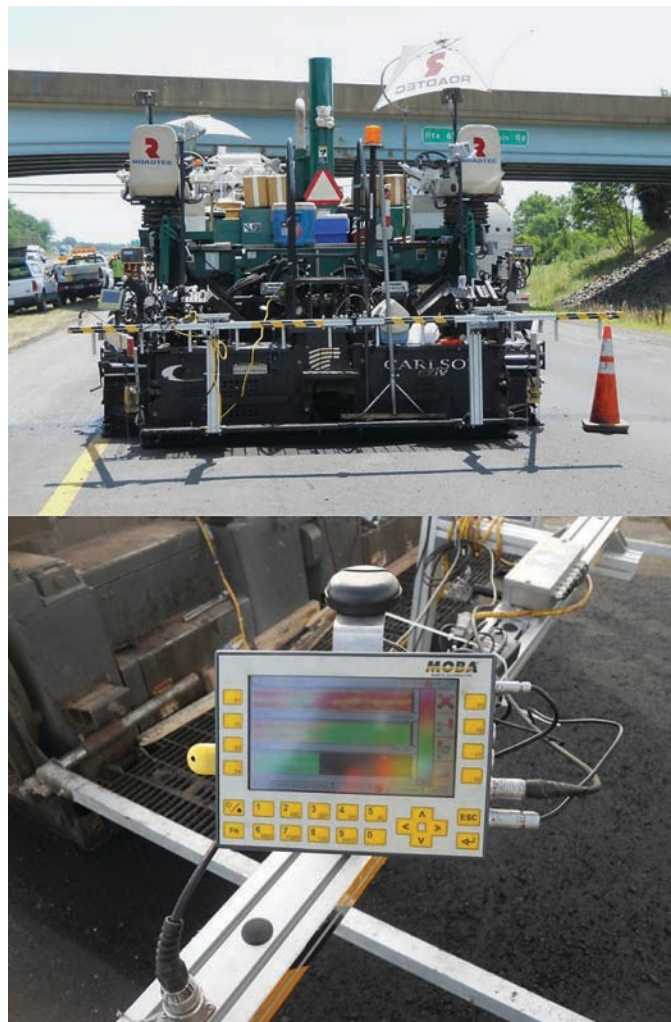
PAVE-IR System used in Centreville, Virginia.
